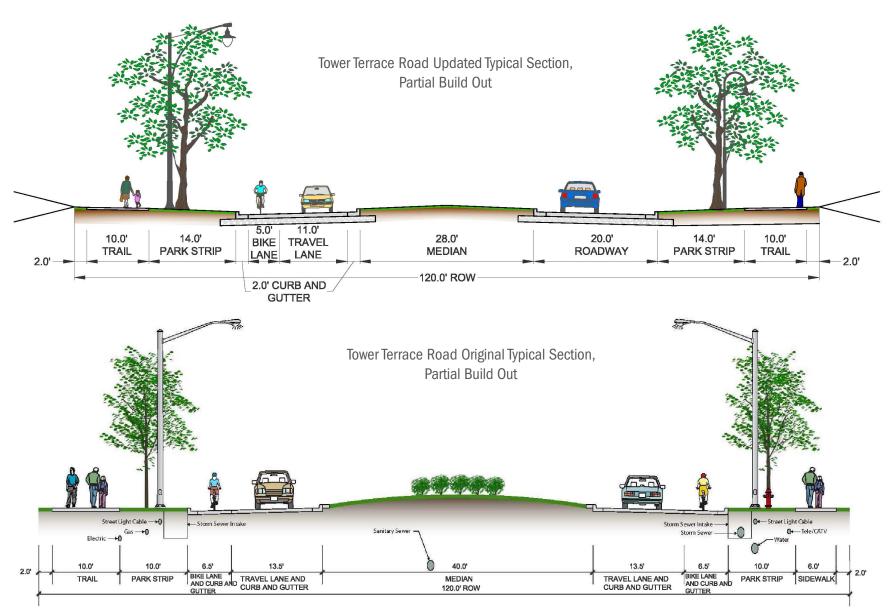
Tower Terrace Road Updated (top) and Original (bottom) Typical Sections for the Partial Build Out
